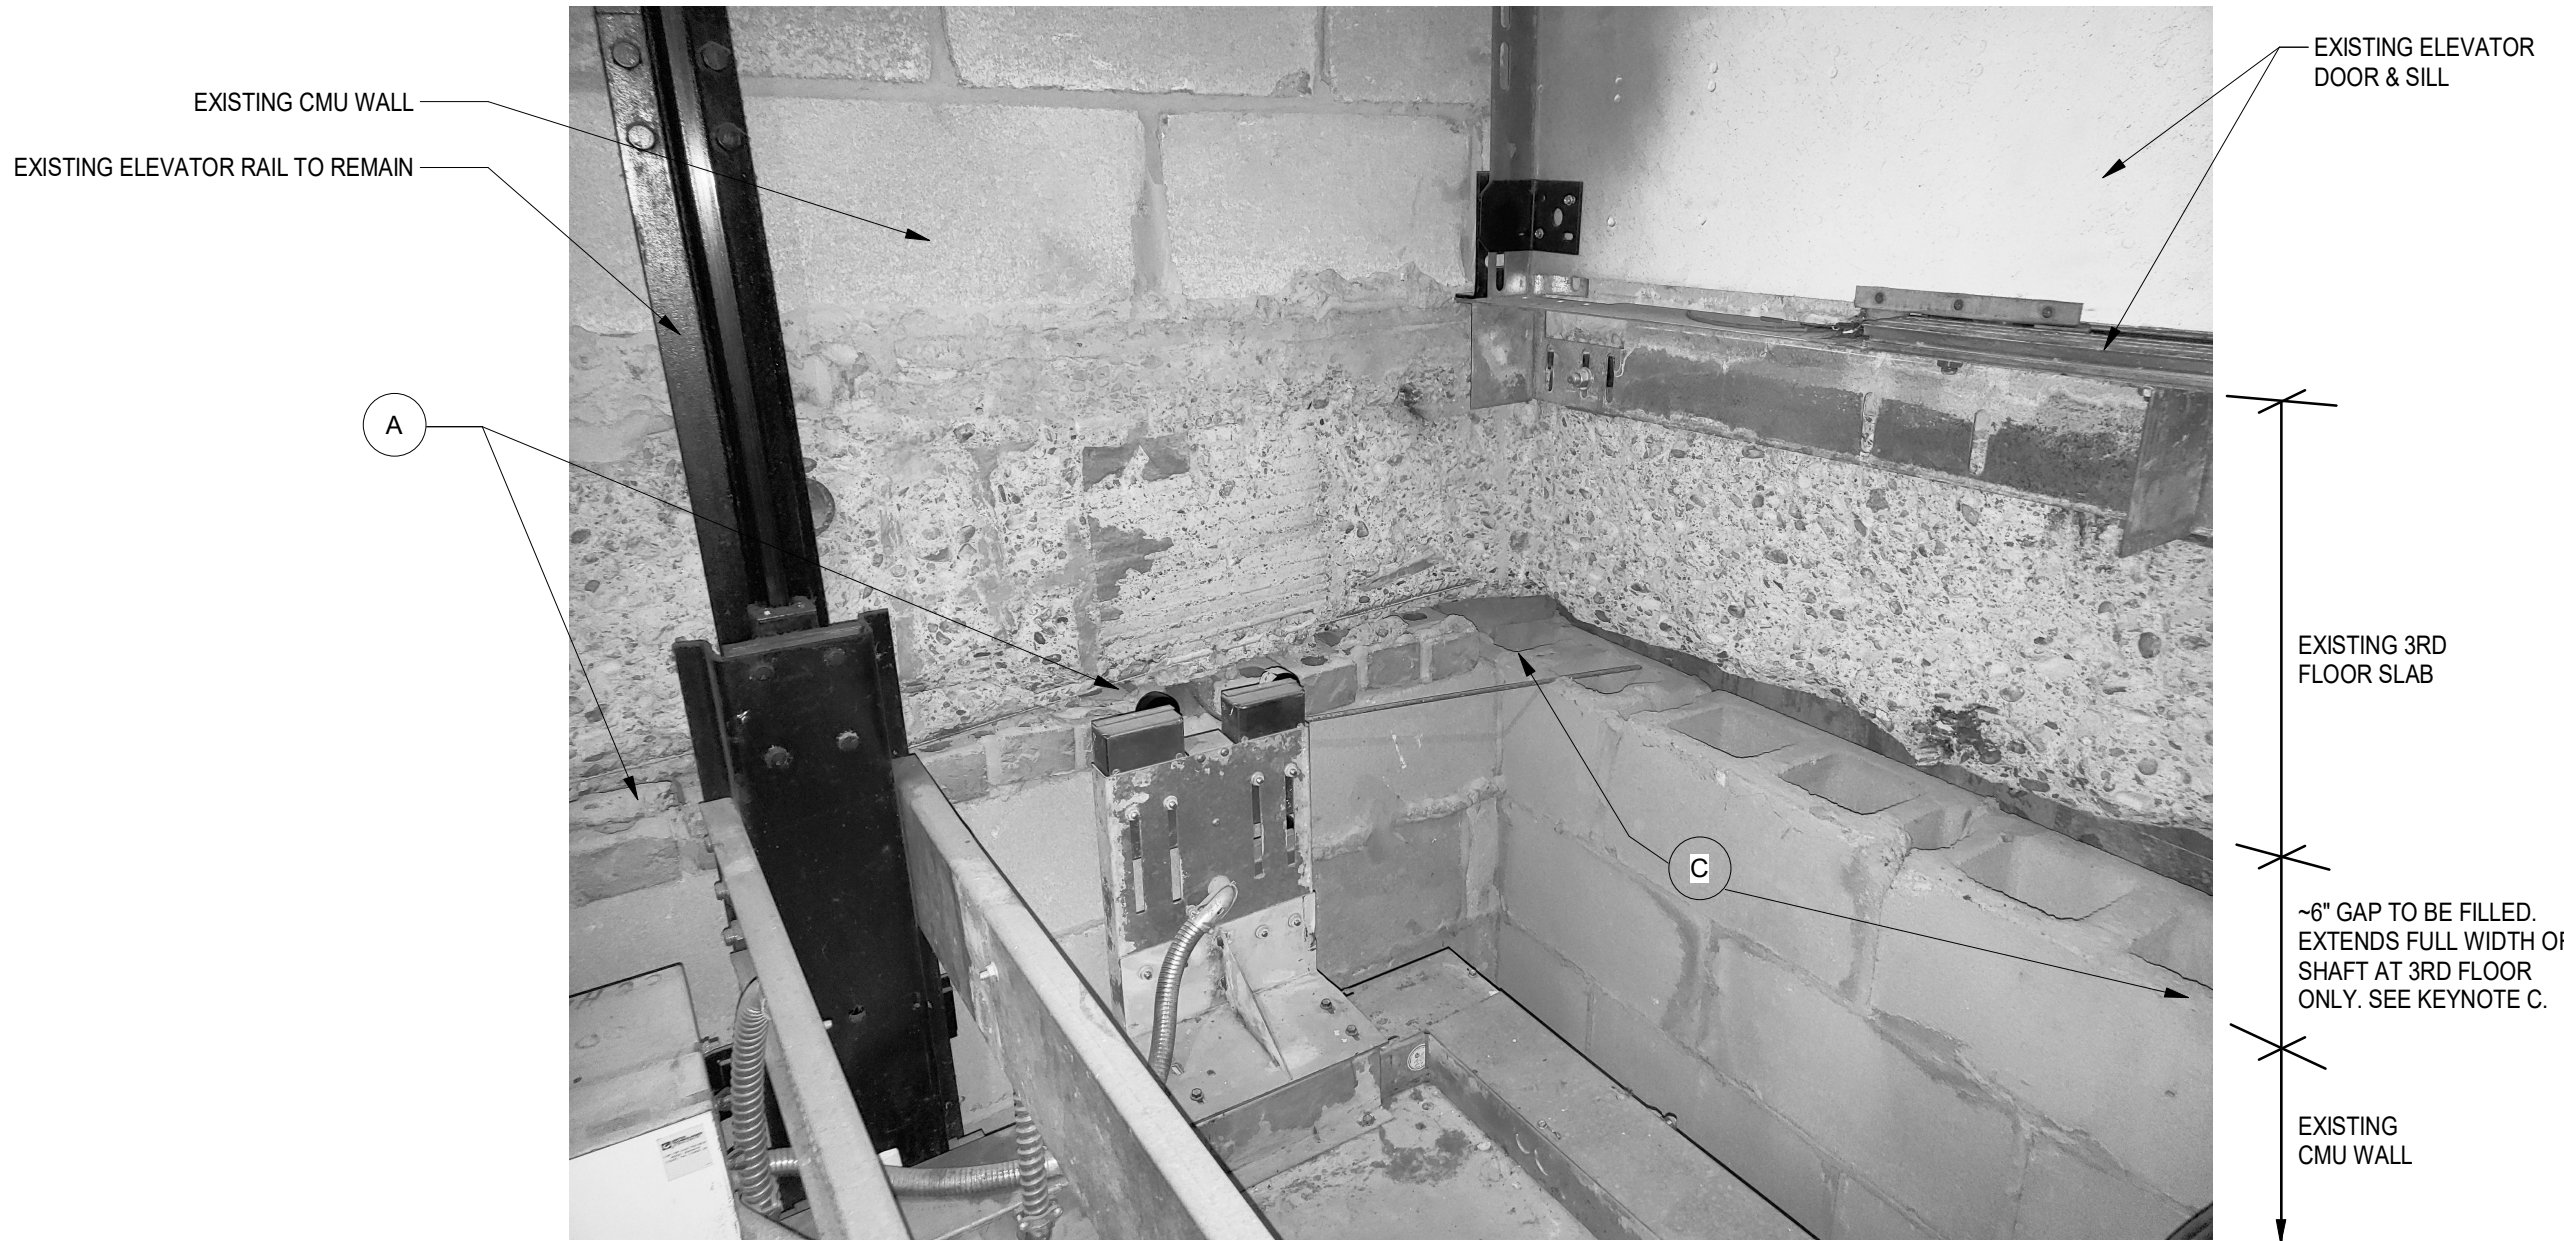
SOUTHEAST CORNER AT 3RD FLOOR LANDING
